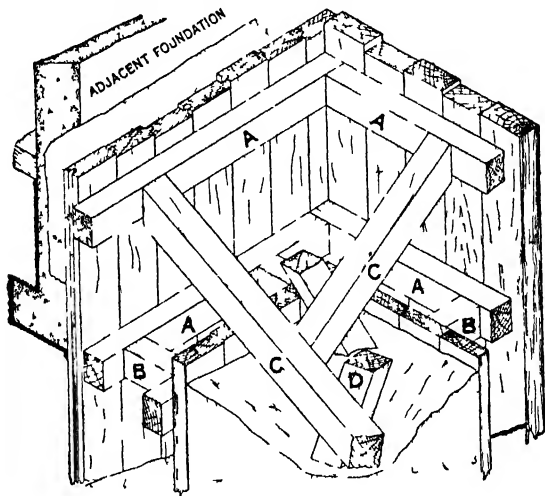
Detail of shoring of construction when an excavation is to extend below an adjacent foundation or one near enough that it might be endangered by it. When the excavation is made as deep as can be safely made, planks of a suitable size are sharpened on the bottom end and driven down behind struts A A A when required to be tight they are tongued and grooved. Braces C C are spiked to the struts and to post anchors D, that are driven securely into the earth. When inside revetment planking is used to form trench, braces B hold them in uniform distance apart. They are removed as the foundation rises.
